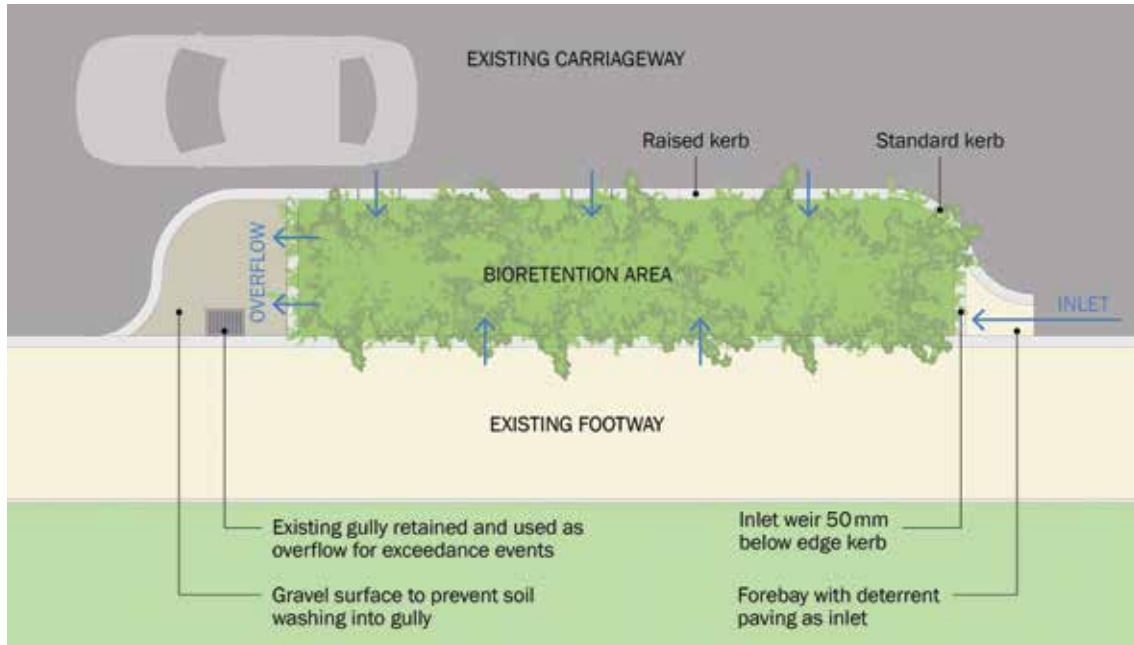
Example of a bioretention system upstream of an existing gully (after Illman Young/EPG Limited)
